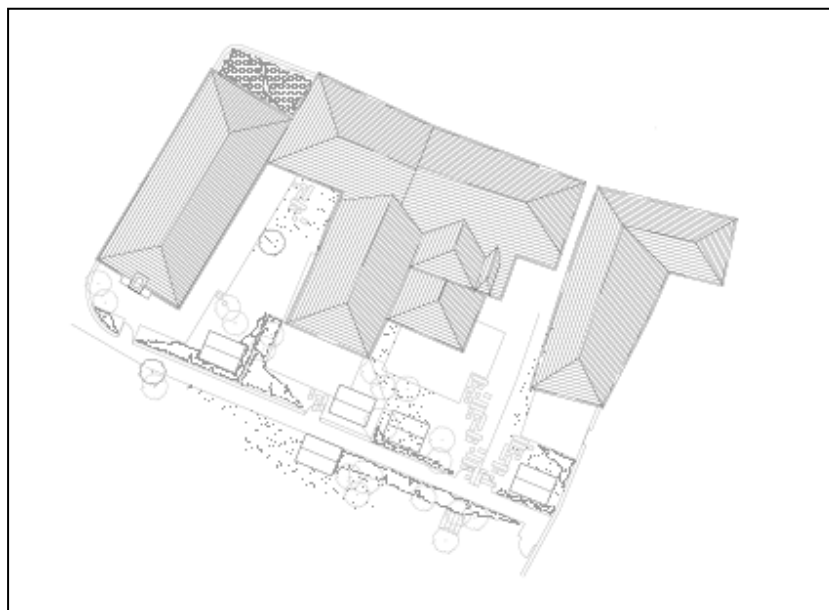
Roof plan of existing frontage units and proposed unit 4.
